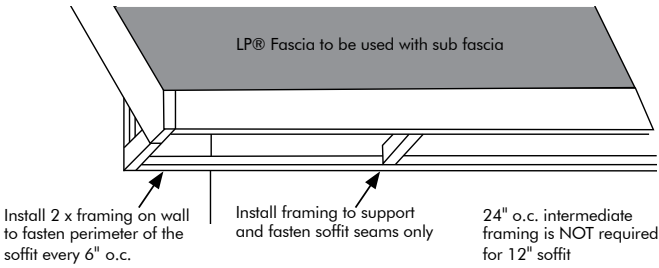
16 IN. AND 24 IN. CUT TO WIDTH SOFFIT FRAMING DIAGRAM
